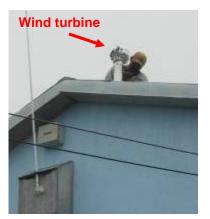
Wind turbine being placed on top of the aluminum insulated vent pipe for the store toilet
